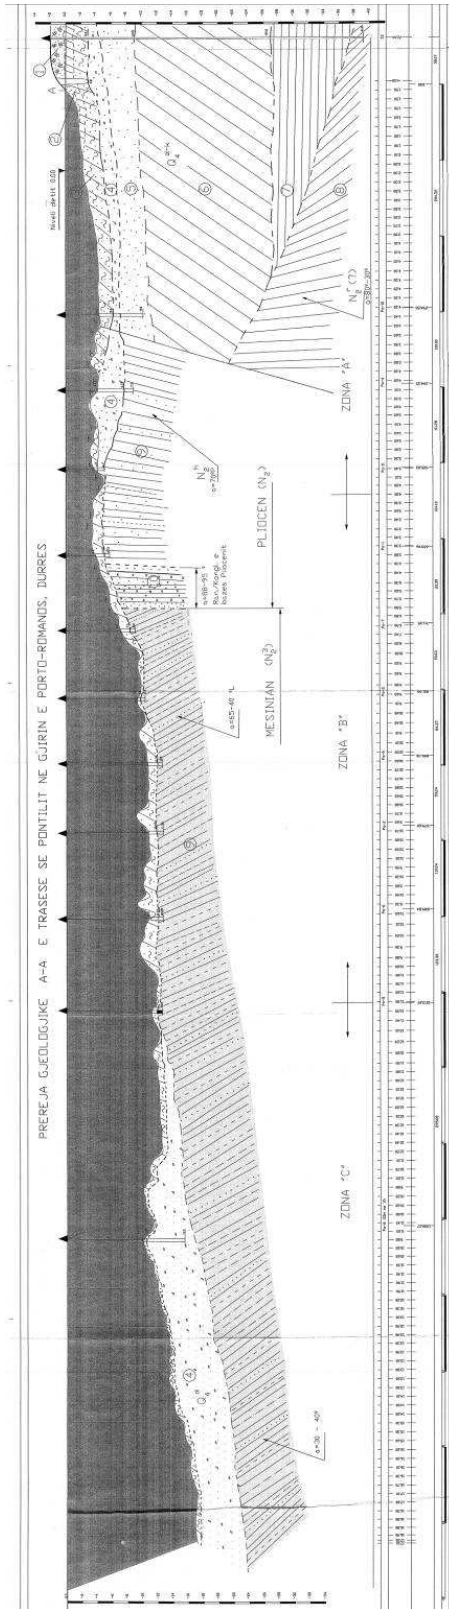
BATHYMETRIC PROFILE OF THE PIER TRACING
